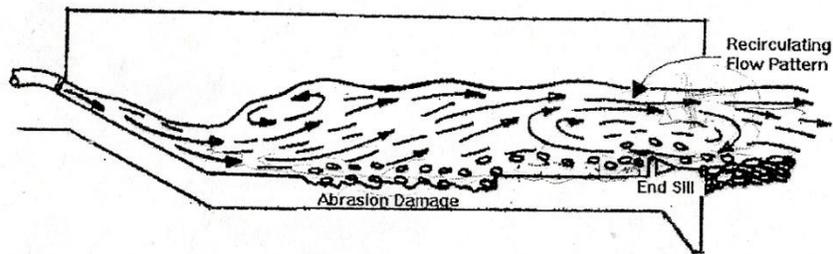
Recirculating Flows in Hydraulic Jump Stilling Basin
